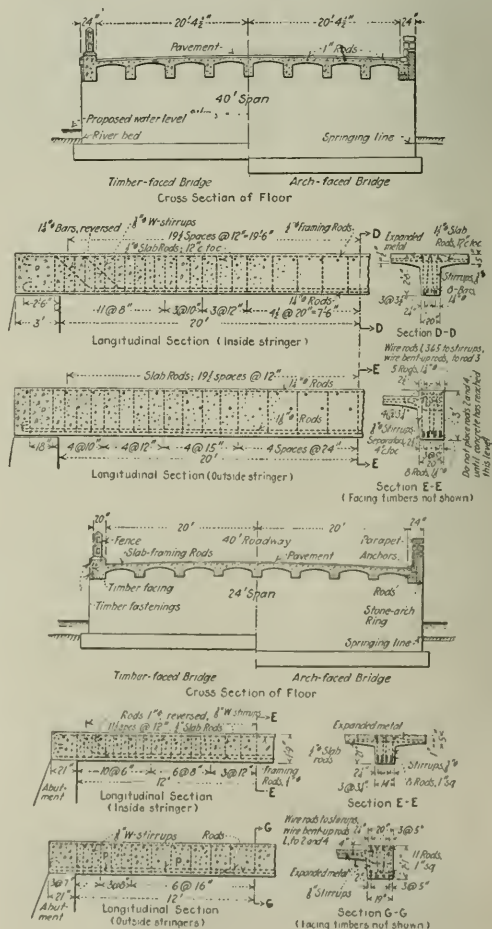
FLOOR CONSTRUCTION OF BEAM BRIDGES
